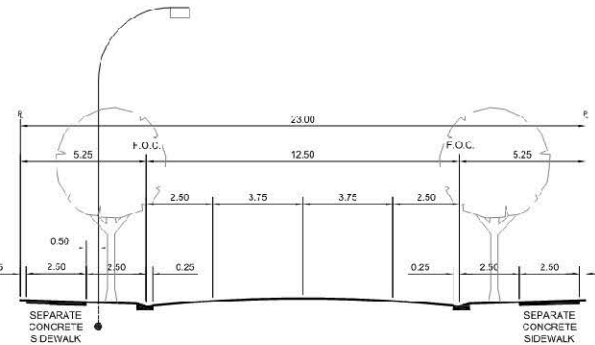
23 m Collector ROW Cross Section New Developments
